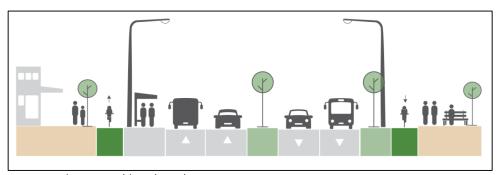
Urban Arterial (32m) – Indicative Cross Section
